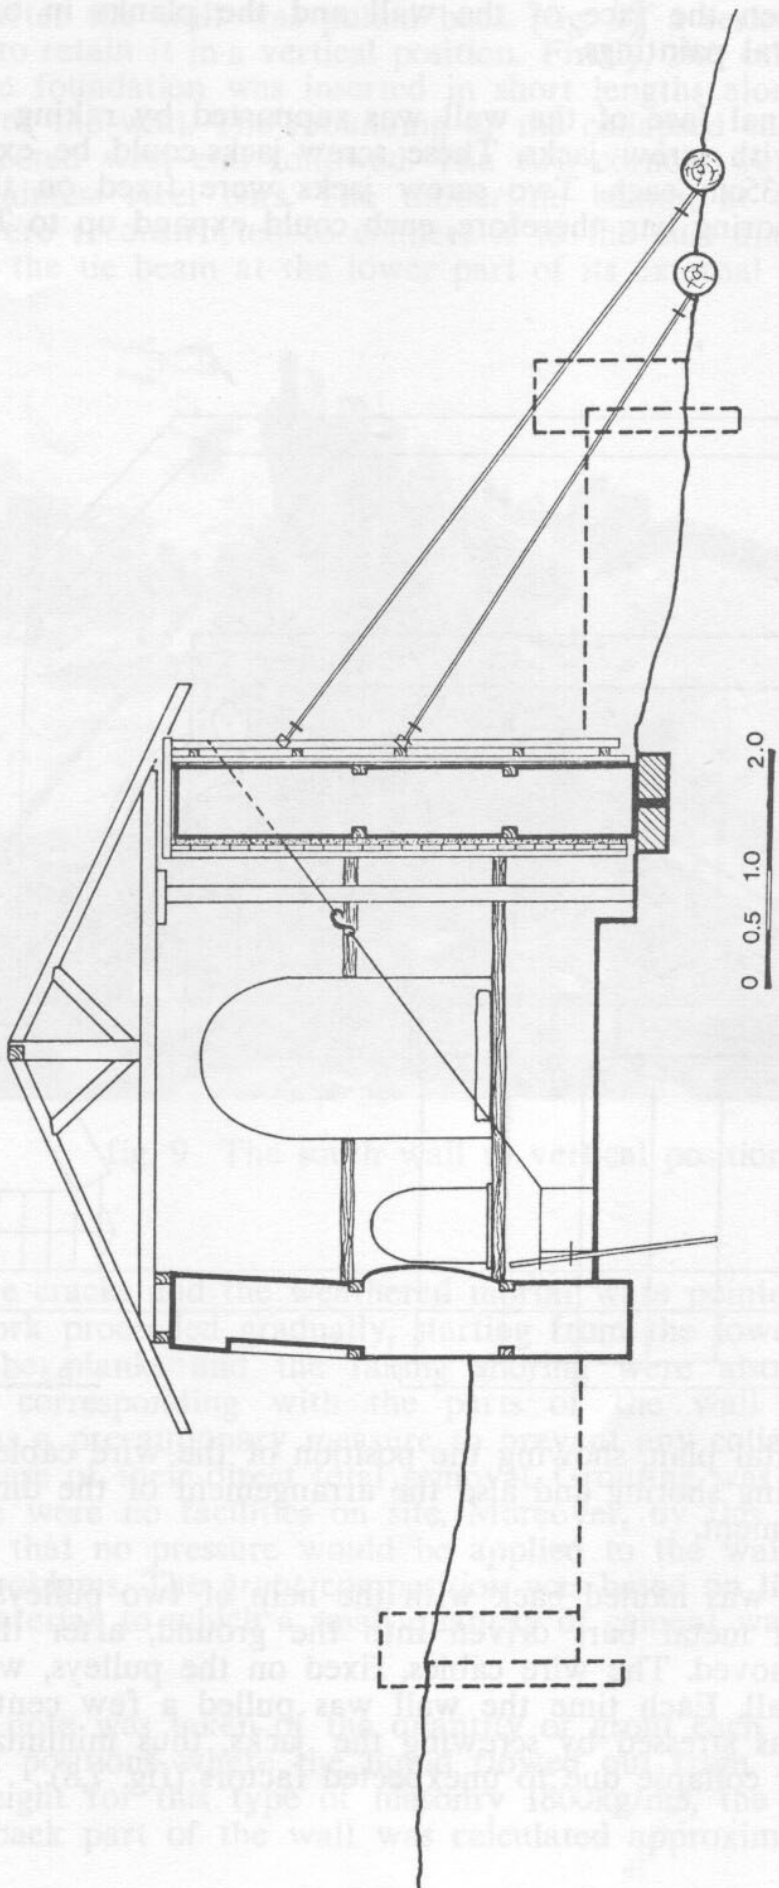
Section showing the south wall to the vertical, the concrete foundation, the shoring and the wire cables. The dotted line shows the arranged level and the retaining walls.
